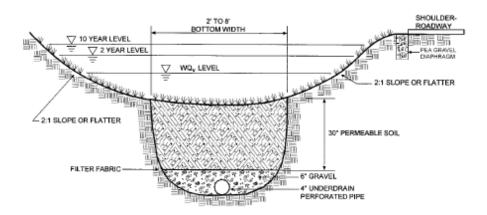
Dry Swale Cross-Section (NYSDEC, 2001)
